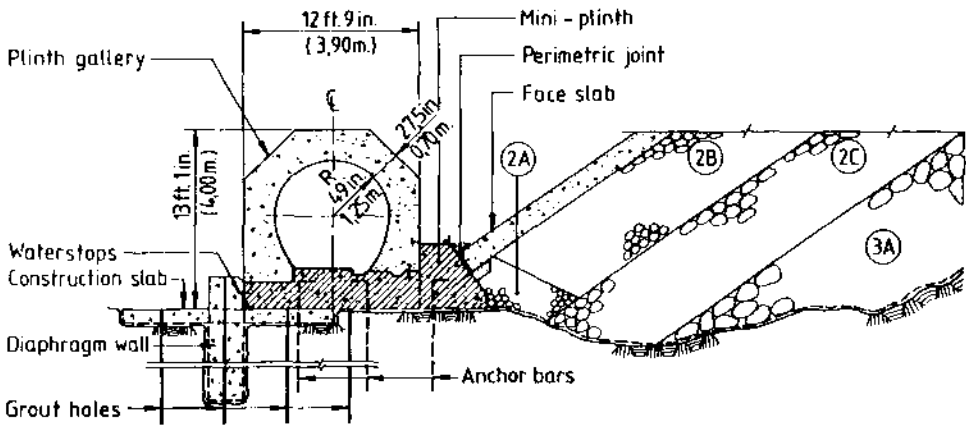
Toe slab and gallery, Khao Laem Dam (Watakeekul et al. 1985).
